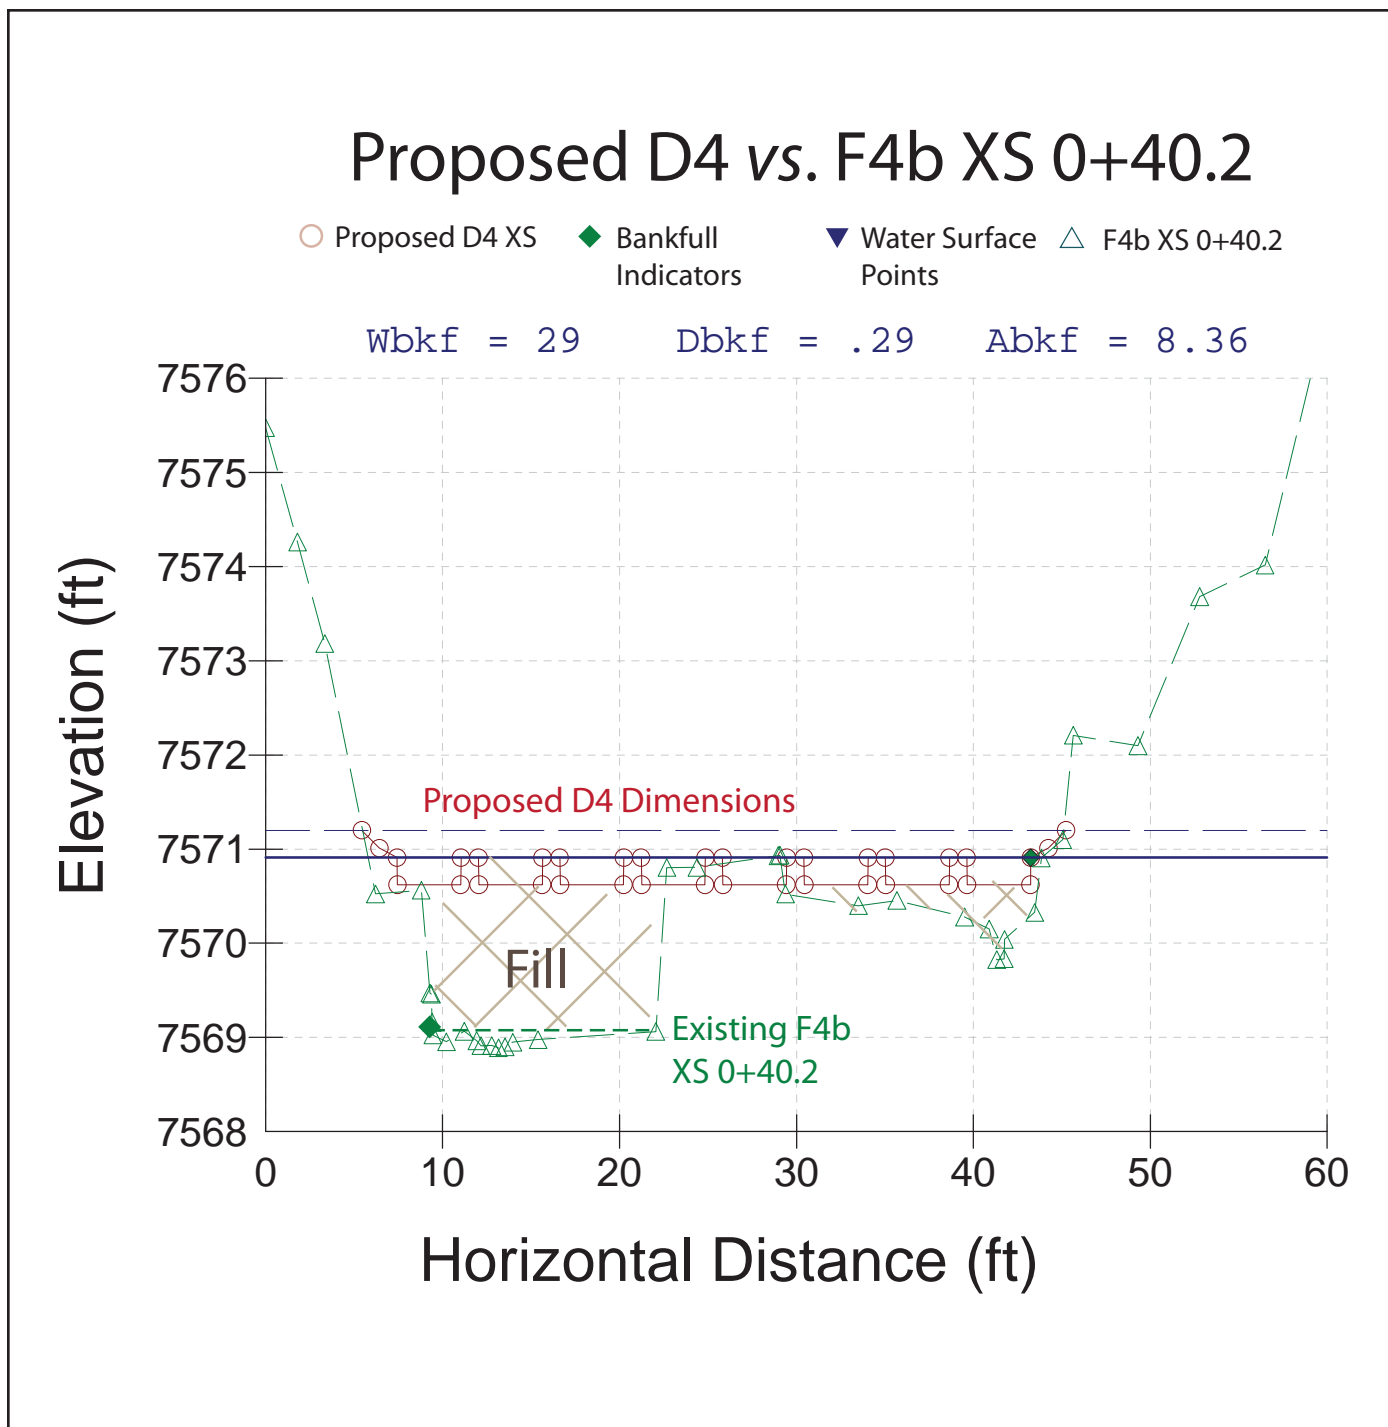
The typical, proposed D4 cross-section dimensions compared to the existing F4b cross-section 0+40.2, indicating the extensive fill requirements and new bankfull elevation.
